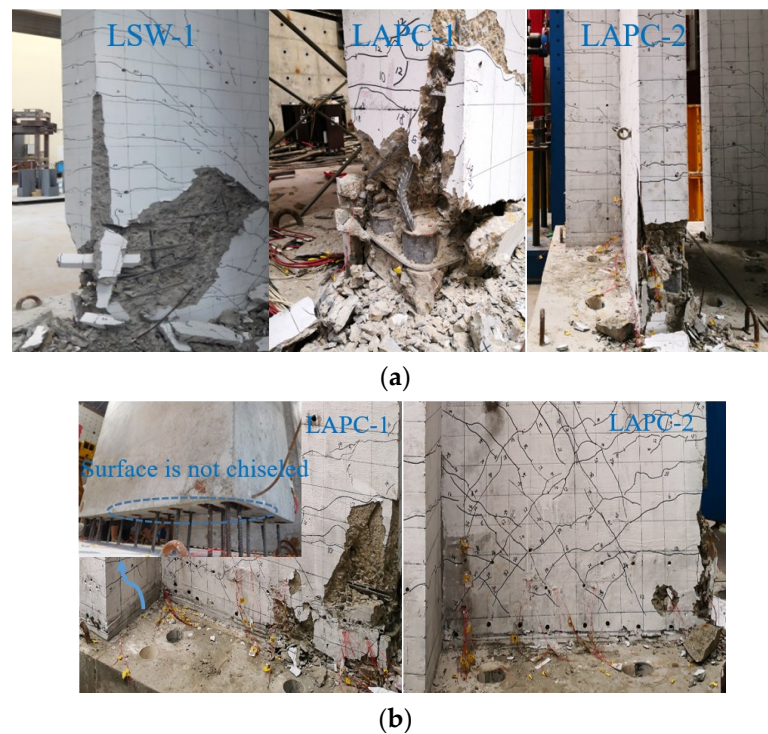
Failure of the root and grouting joint of L-shaped shear walls under ultimate load: (a) root of specimens; and (b) grouting joint of prefabricated specimens.
